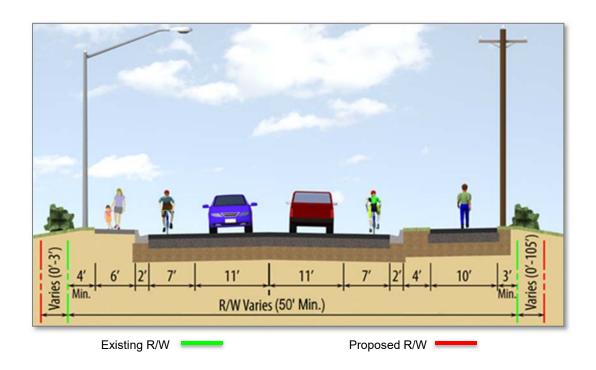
BUILD ALTERNATIVE 1 - ROADWAY TYPICAL SECTION
